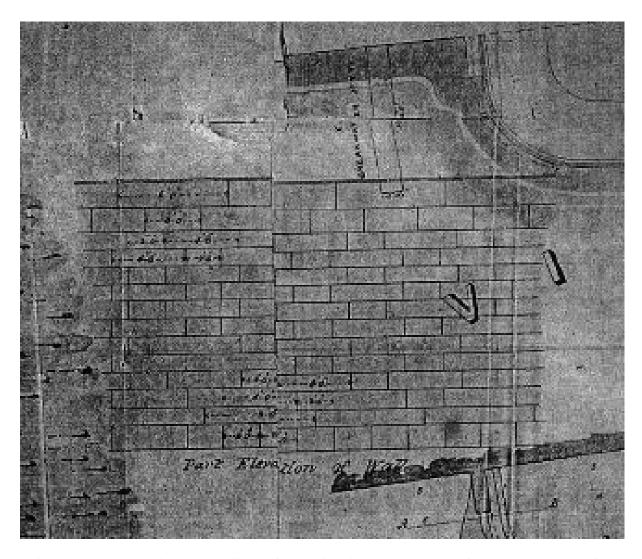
a Example of seawall façade with blocks measurements between 2, 3, 4 and 6ft.
